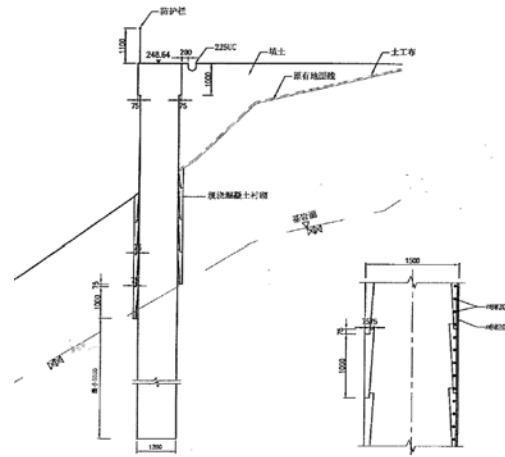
Proposed 1st Upgrading Scheme – Section and Detail of Proposed Hang Dug Caisson Wall
